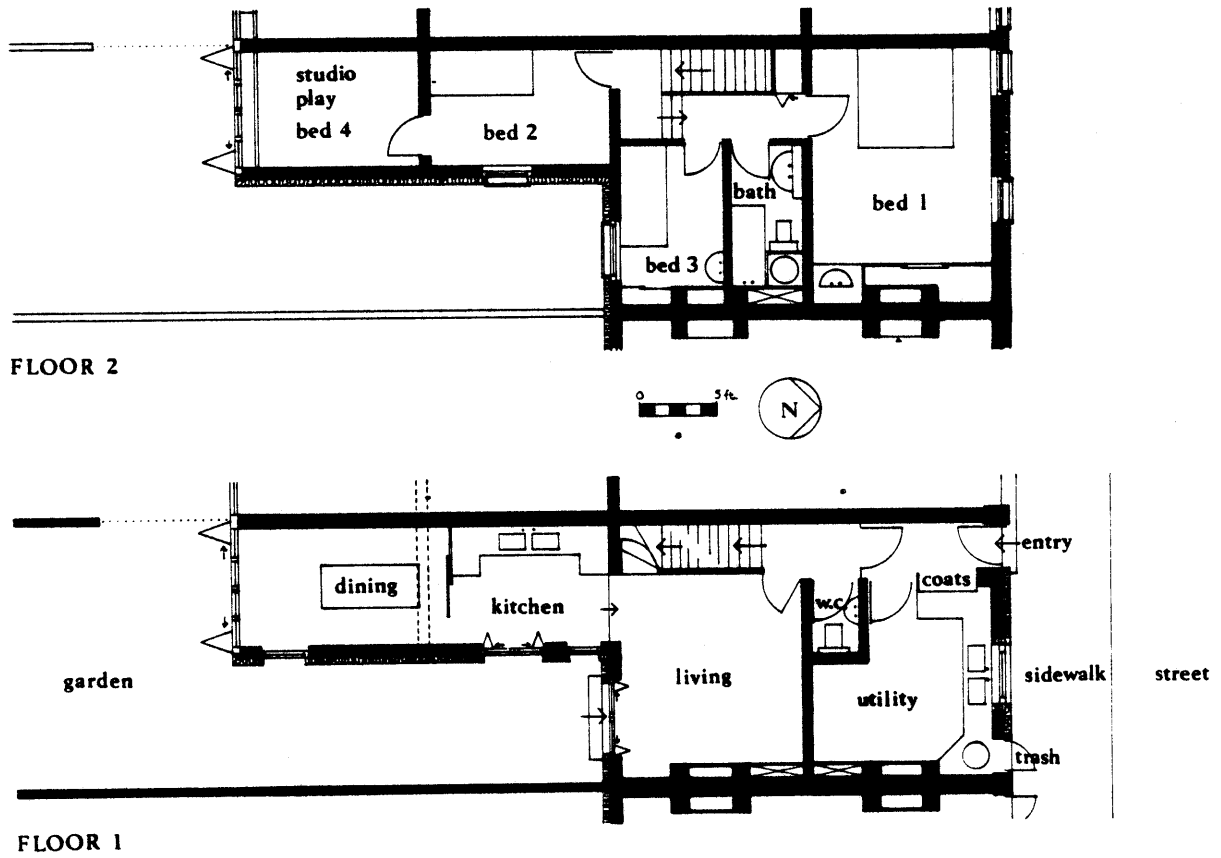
Solar design. Plans showing suggested improvements to existing row houses.
